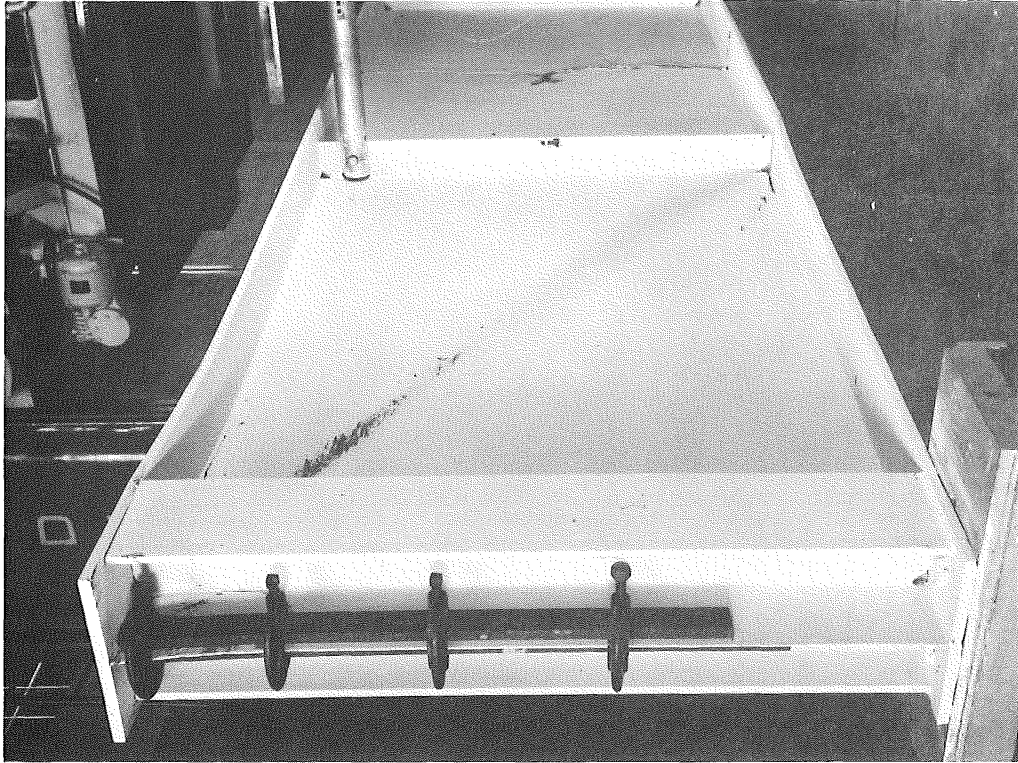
Reinforcement After Premature End Panel Failure, Girder G9
